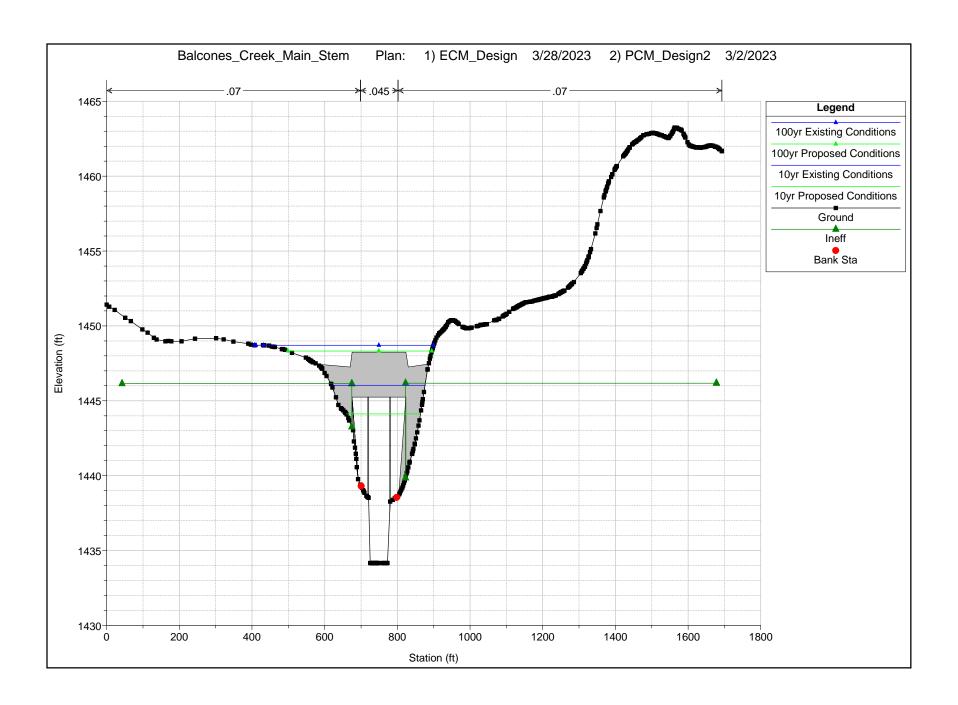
Toutant Beauregard Road LWC: Proposed Conditions
